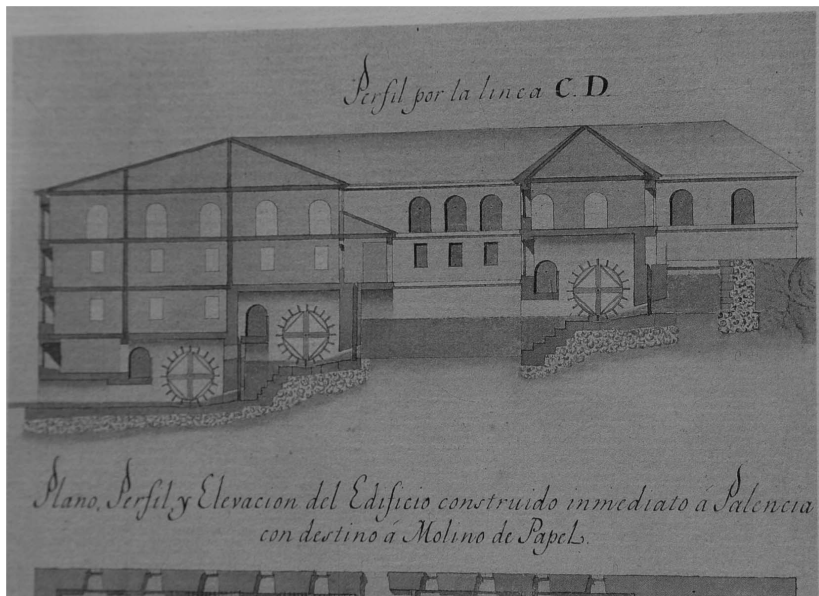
Cross section of the Viñalta's Paper Mill showing its three hydraulic wheels.
